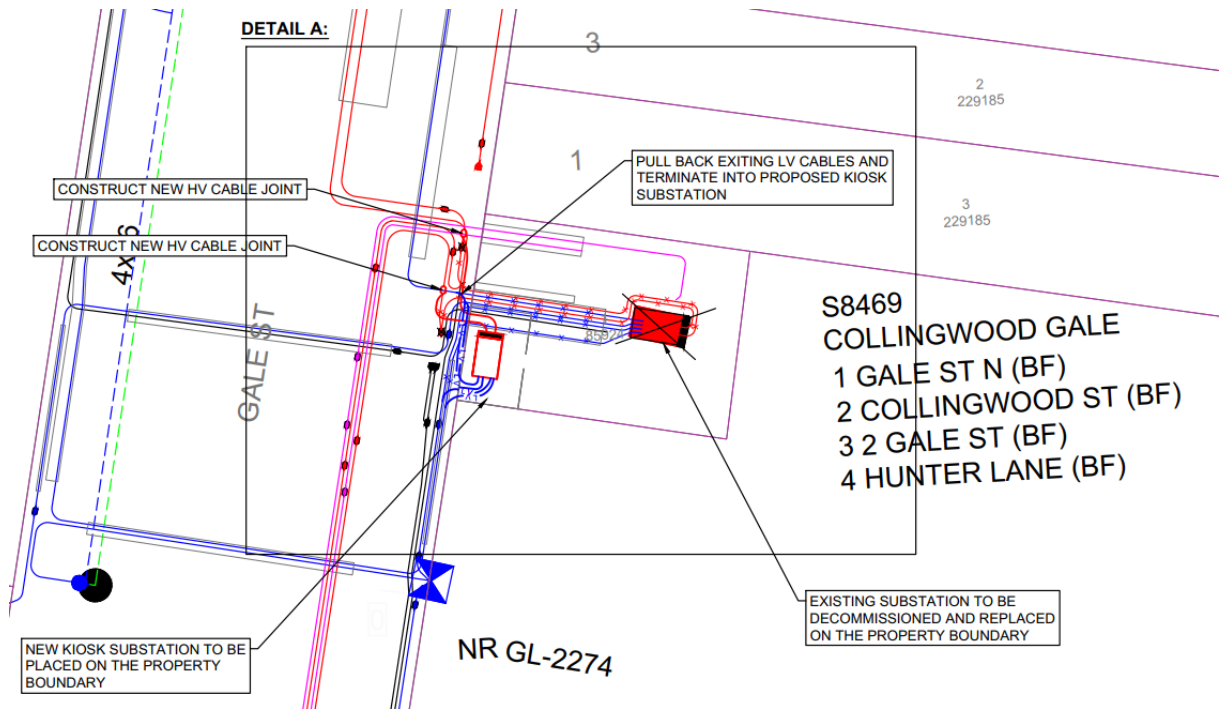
Extract of Proposed Works Plan (Source: Proposed Works Plan, AA Power Engineering)
